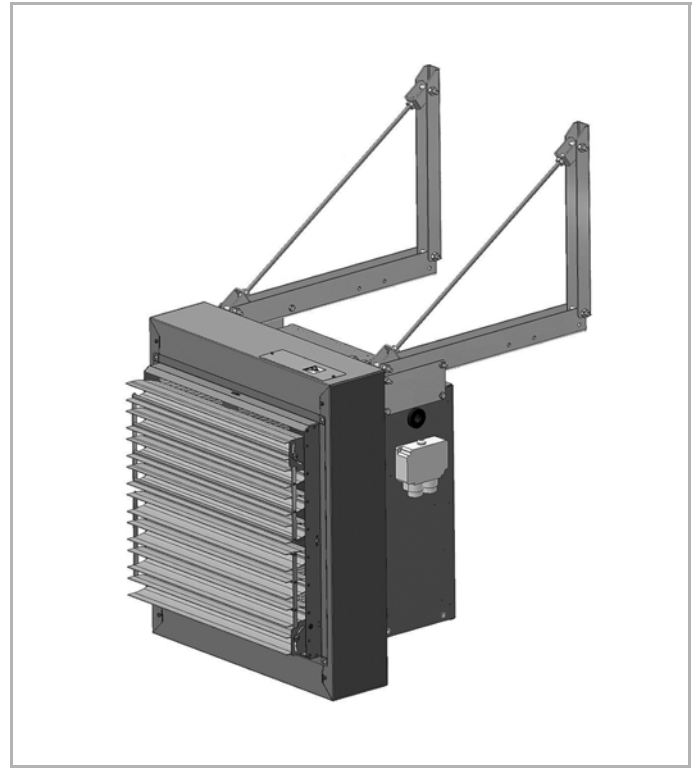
Wall mounting of a recirculating air unit with modular suspension (ZH#.550#)
